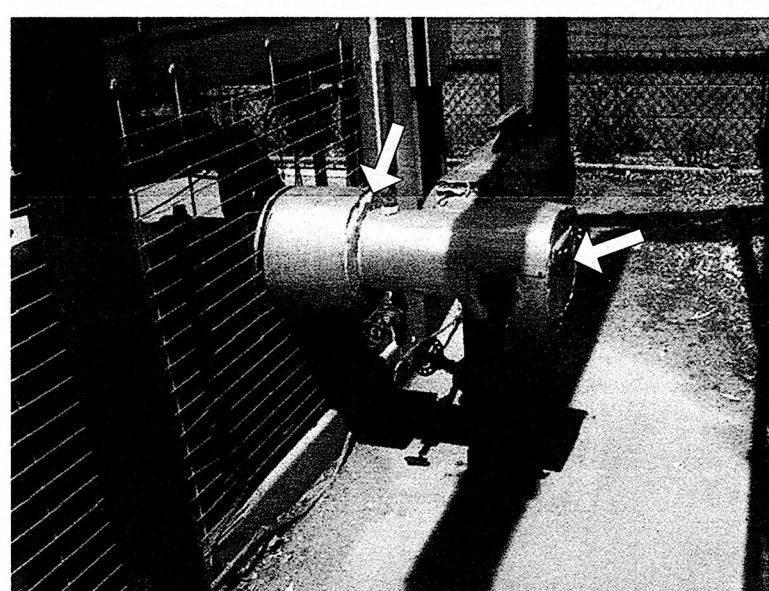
ASBESTOS-CONTAINING MUDDED JOINT PACKING LOCATED ON CHILLER PIPING ENDS TO BE REMOVED
